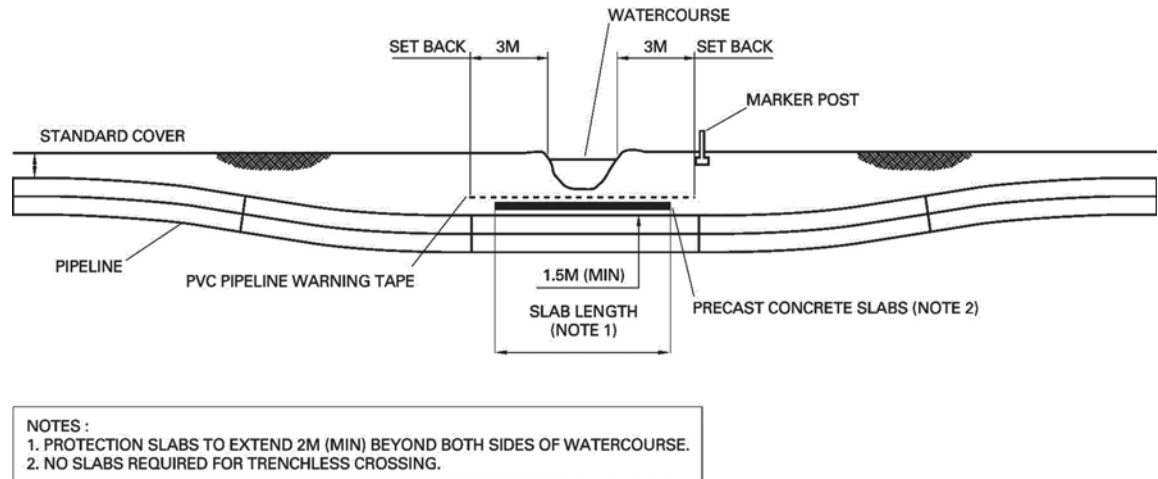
Preliminary Typical Ditch/Stream Crossing (width less than 5m)
